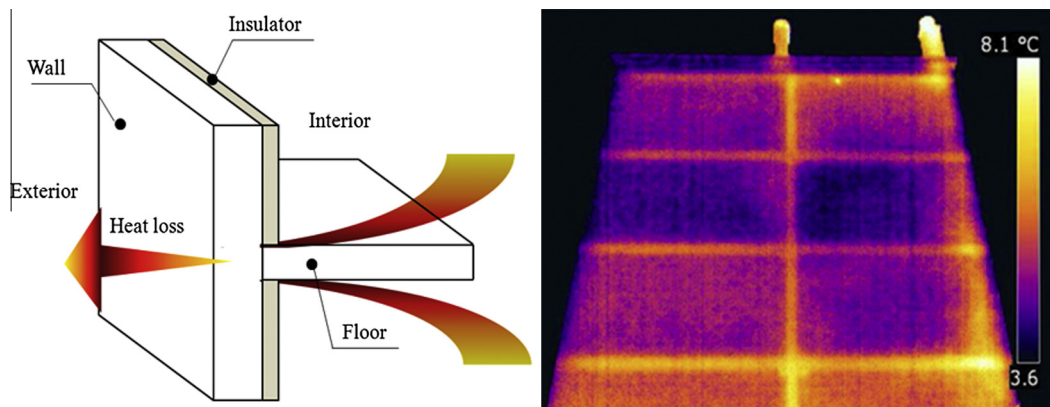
Junction with thermal bridge (left) and thermal bridges in a house by infrared (right) [1].
